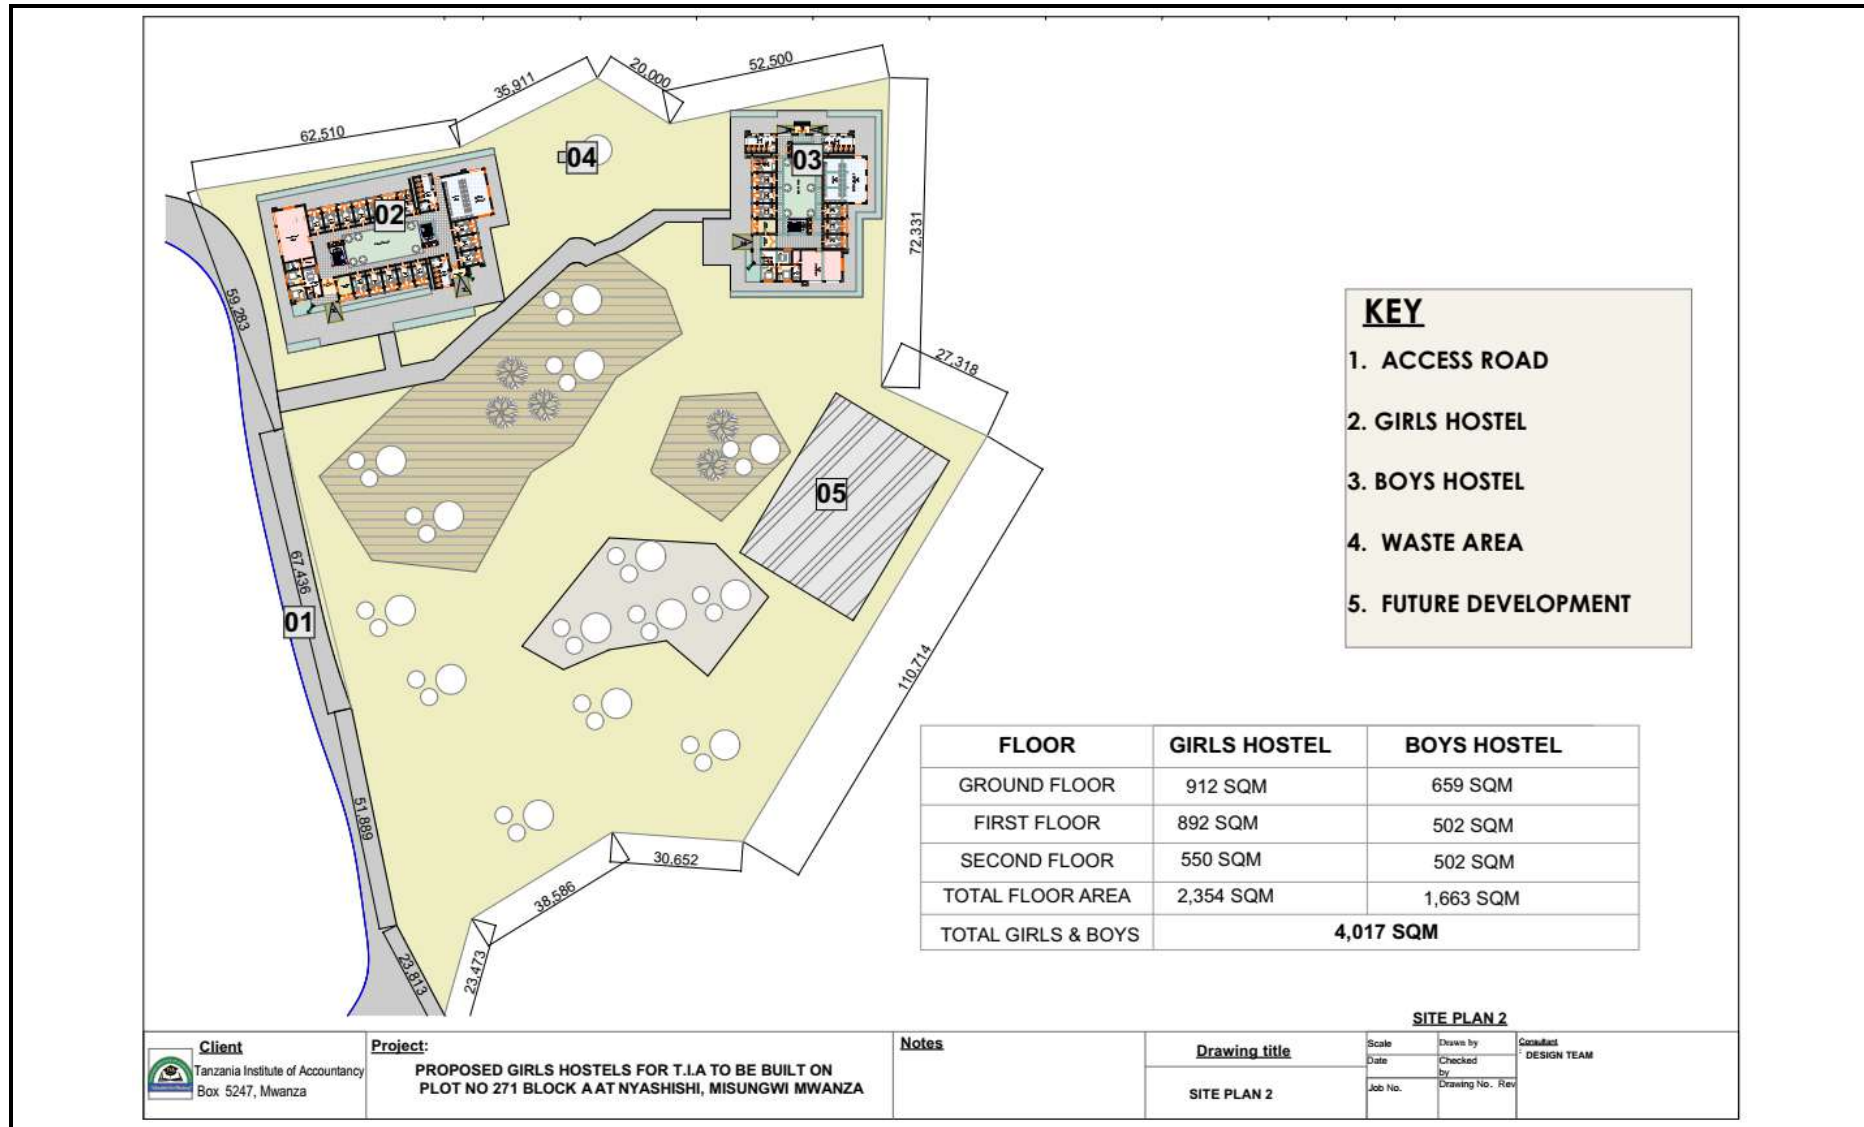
1 Proposed TIA Mwanza Campus Master Plan(TIA, 2023)
